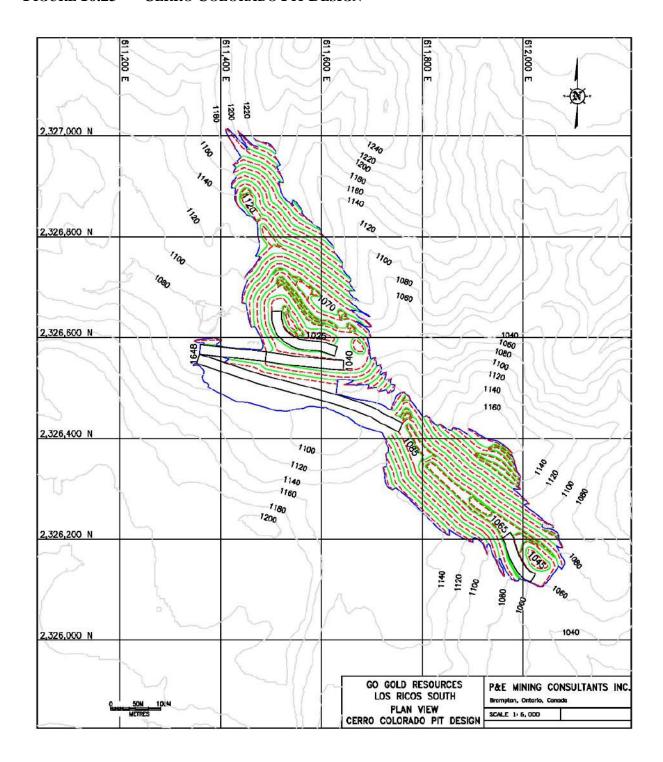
CERRO COLORADO PIT DESIGN
